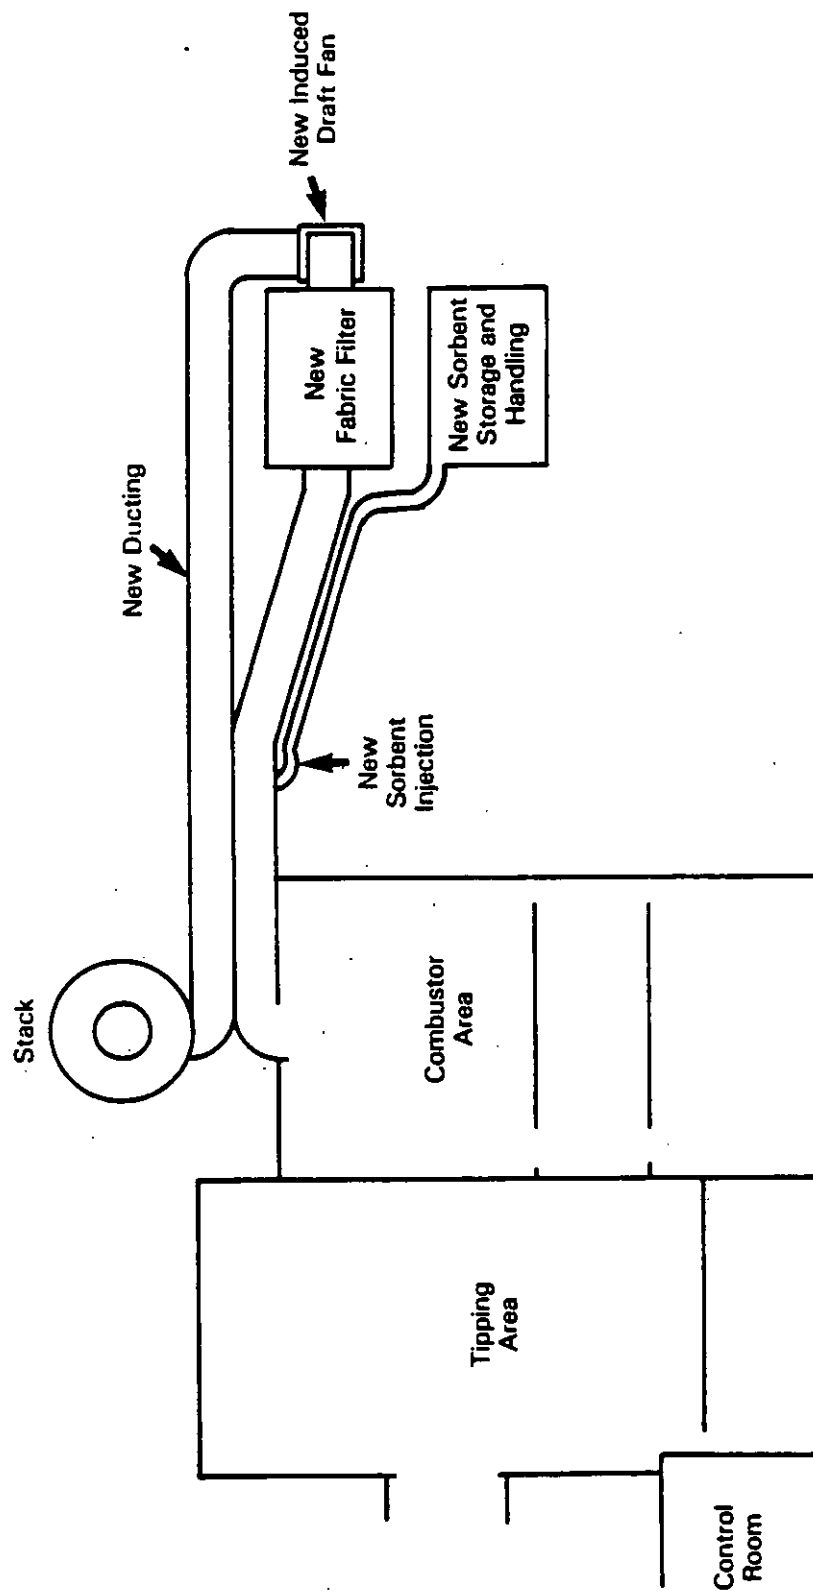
Plot Plan of Dry Sorbent Injection/Fabric Filter Equipment Arrangement.
